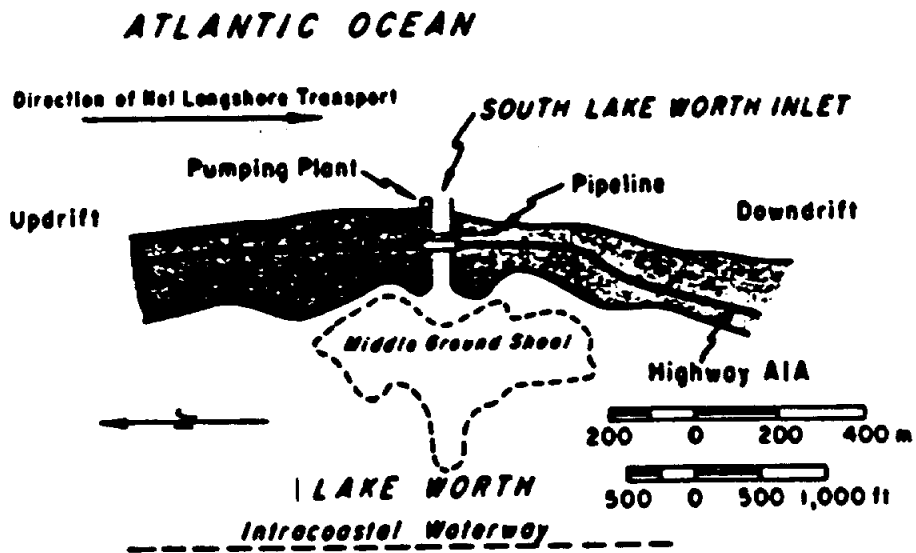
Fixed bypassing plant, South Lake Worth Inlet, Florida.
